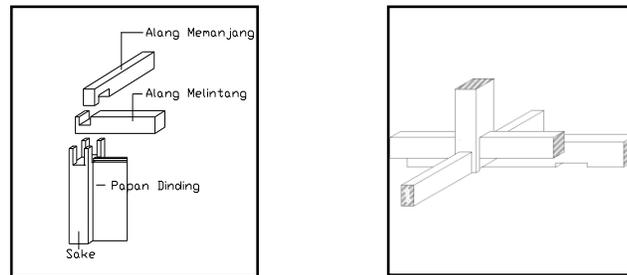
Detail join of column and beam in upper and lower part, sponge at column for inserting wood plank.
